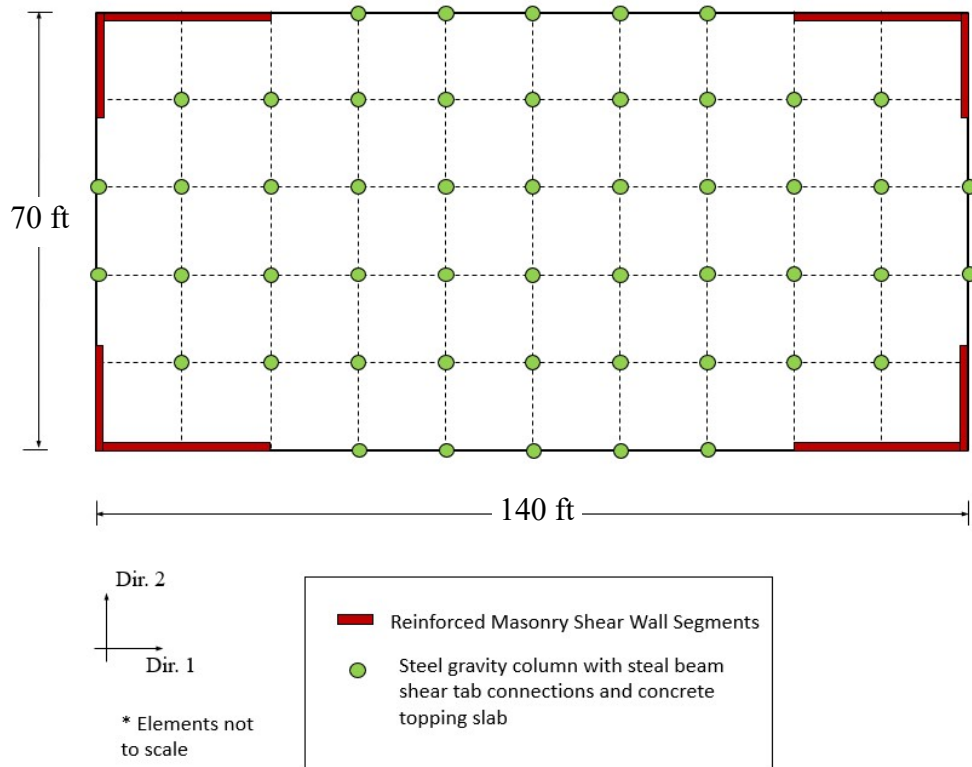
Illustration of assumed plan layouts for SRMSW archetypes with population of structural components.
